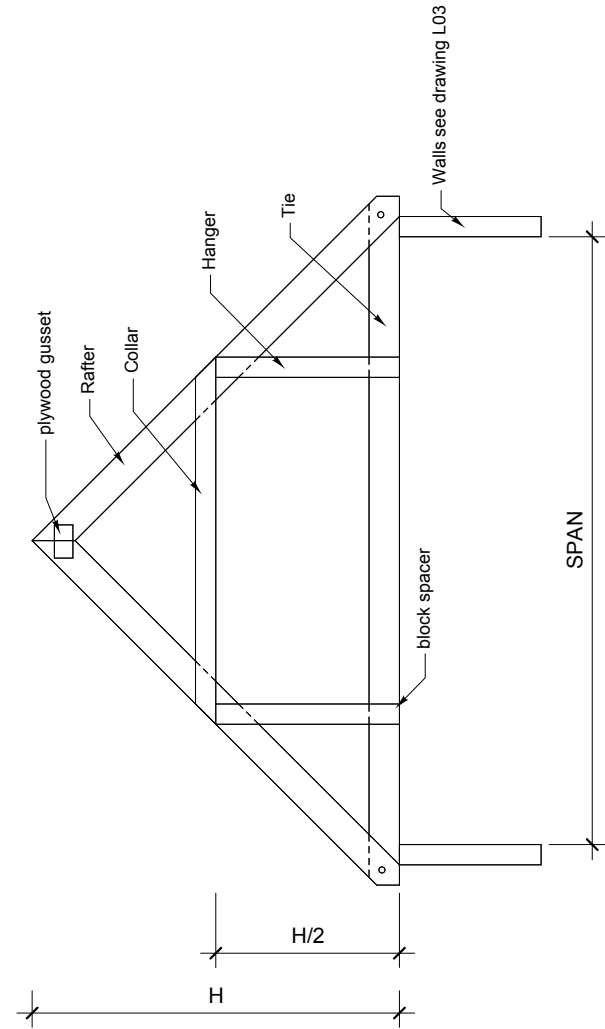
ROOF TRUSSES Stud Frame - Appendix 2
